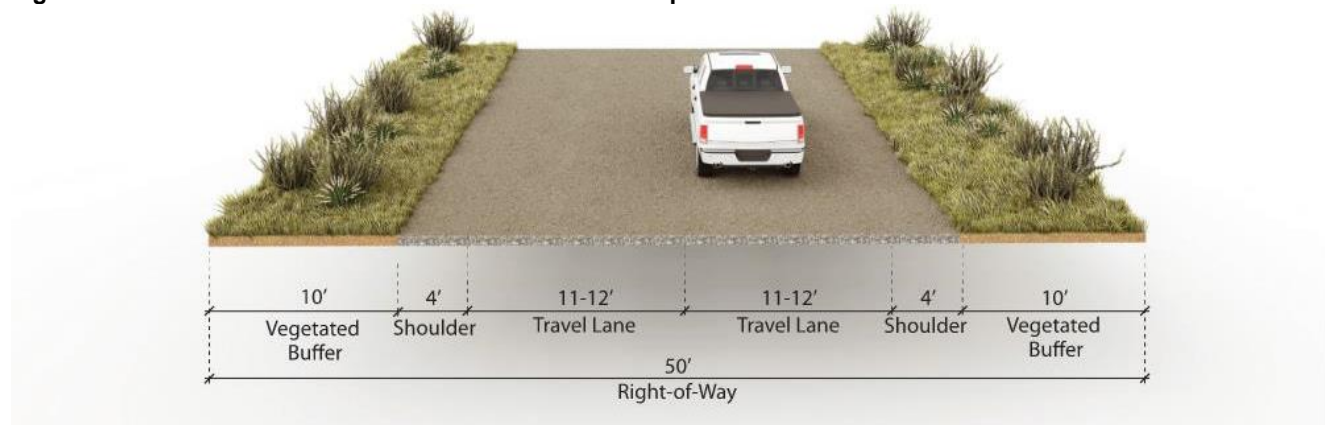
Cross-section for Urban Local Street – Standard Residential Street
